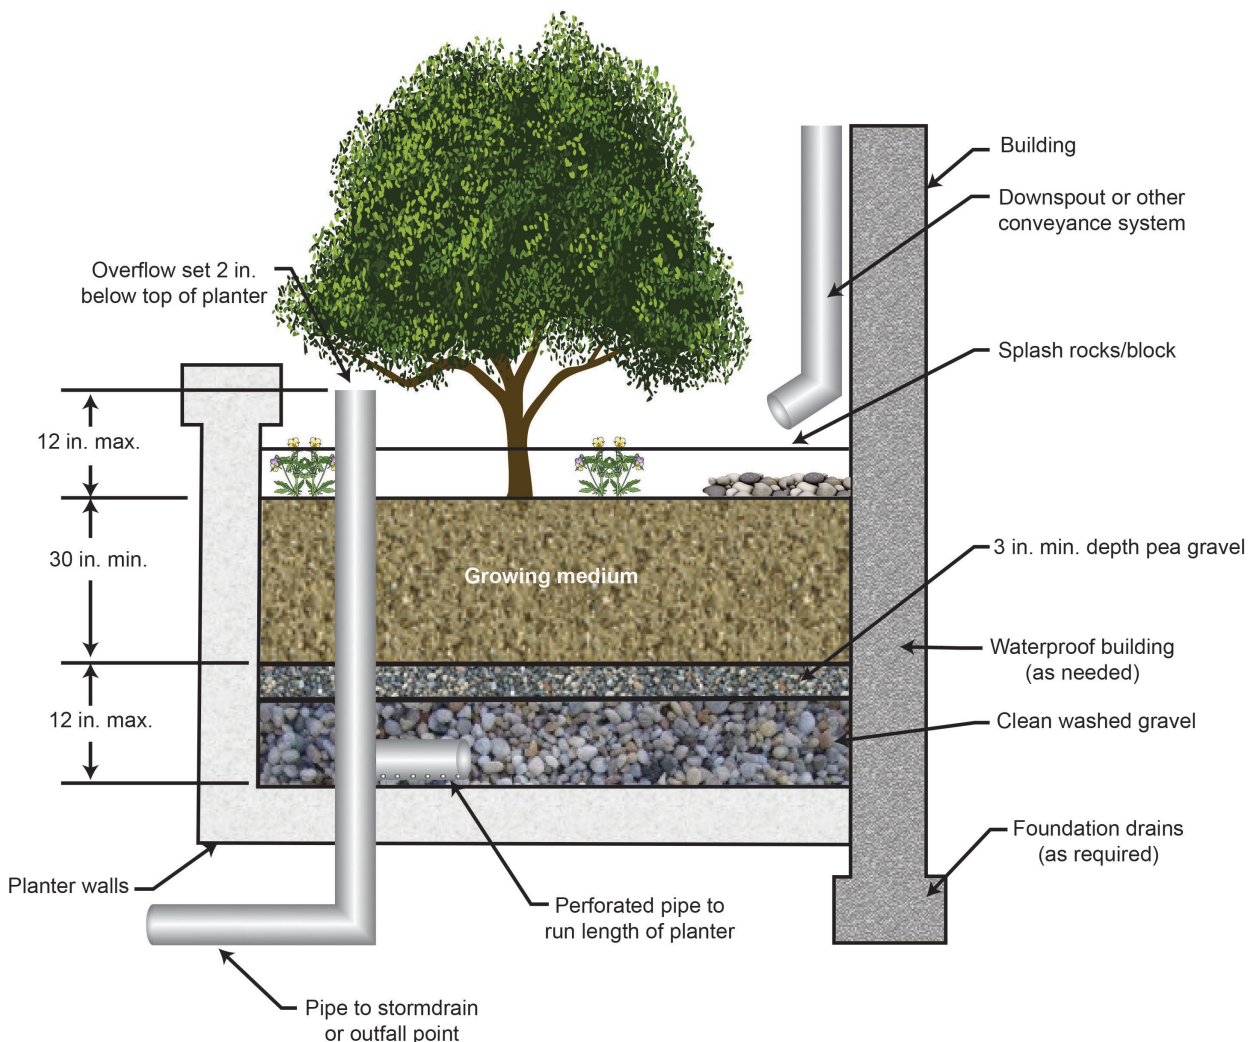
Cross section of an impervious, noninfiltrating, flow-through storm water planter.
